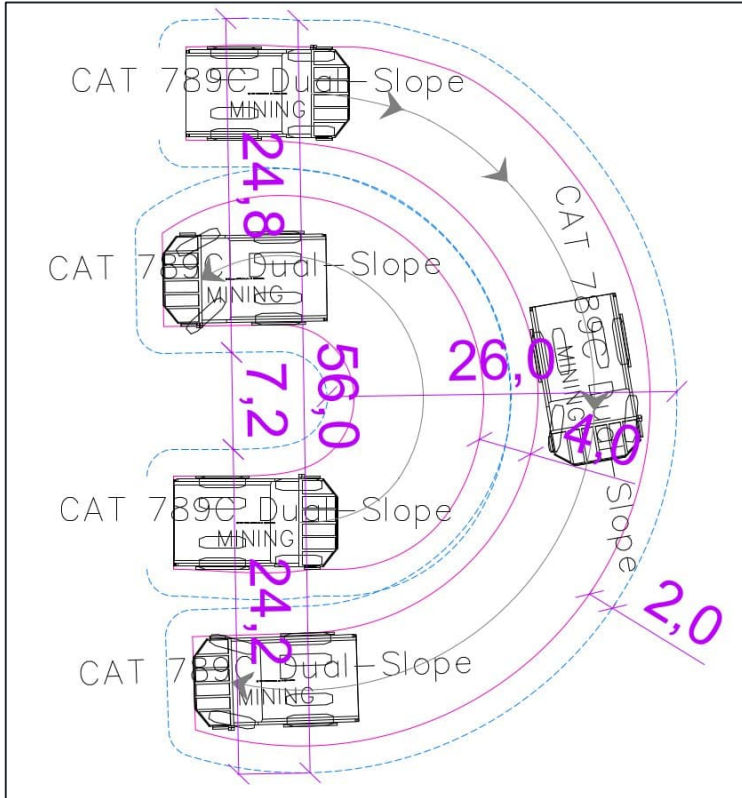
Ramp Switchback Dimensioning (Units in Metres)
